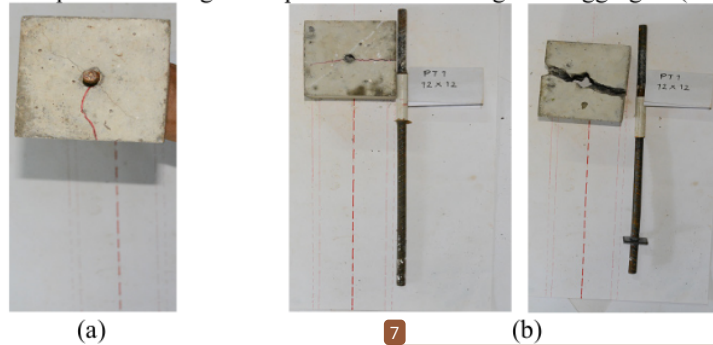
Failure mode of bond specimens, (a) Pull out failure, (b) Splitting failure
